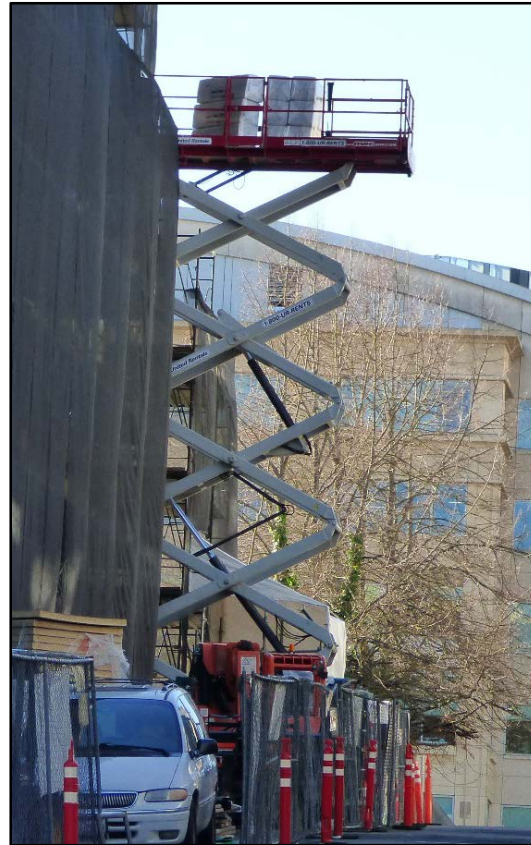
Incident scene showing scissor lift with platform elevated to the sixth floor of an apartment building under construction.
